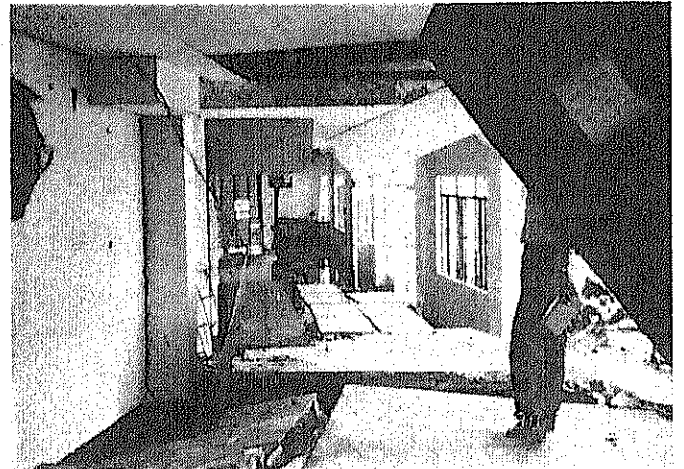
Damage to building at approach to right bank of Magsaysay Bridge; Inside the building
